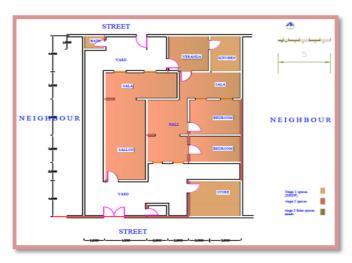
Eglas Ibraheim house Ground floor plan(Source: Author)
